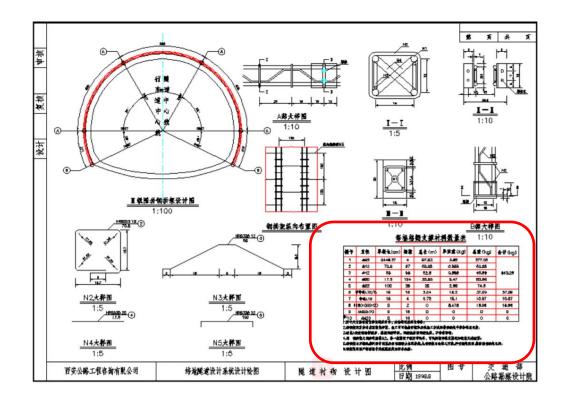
Tunnel lining design drawing generated with HintSD [21].
